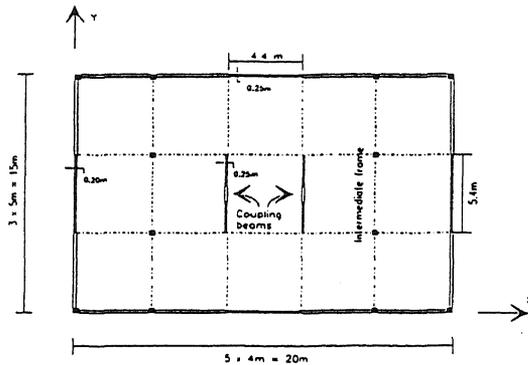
Plan view of the hybrid (frame/shear-wall) structure.
